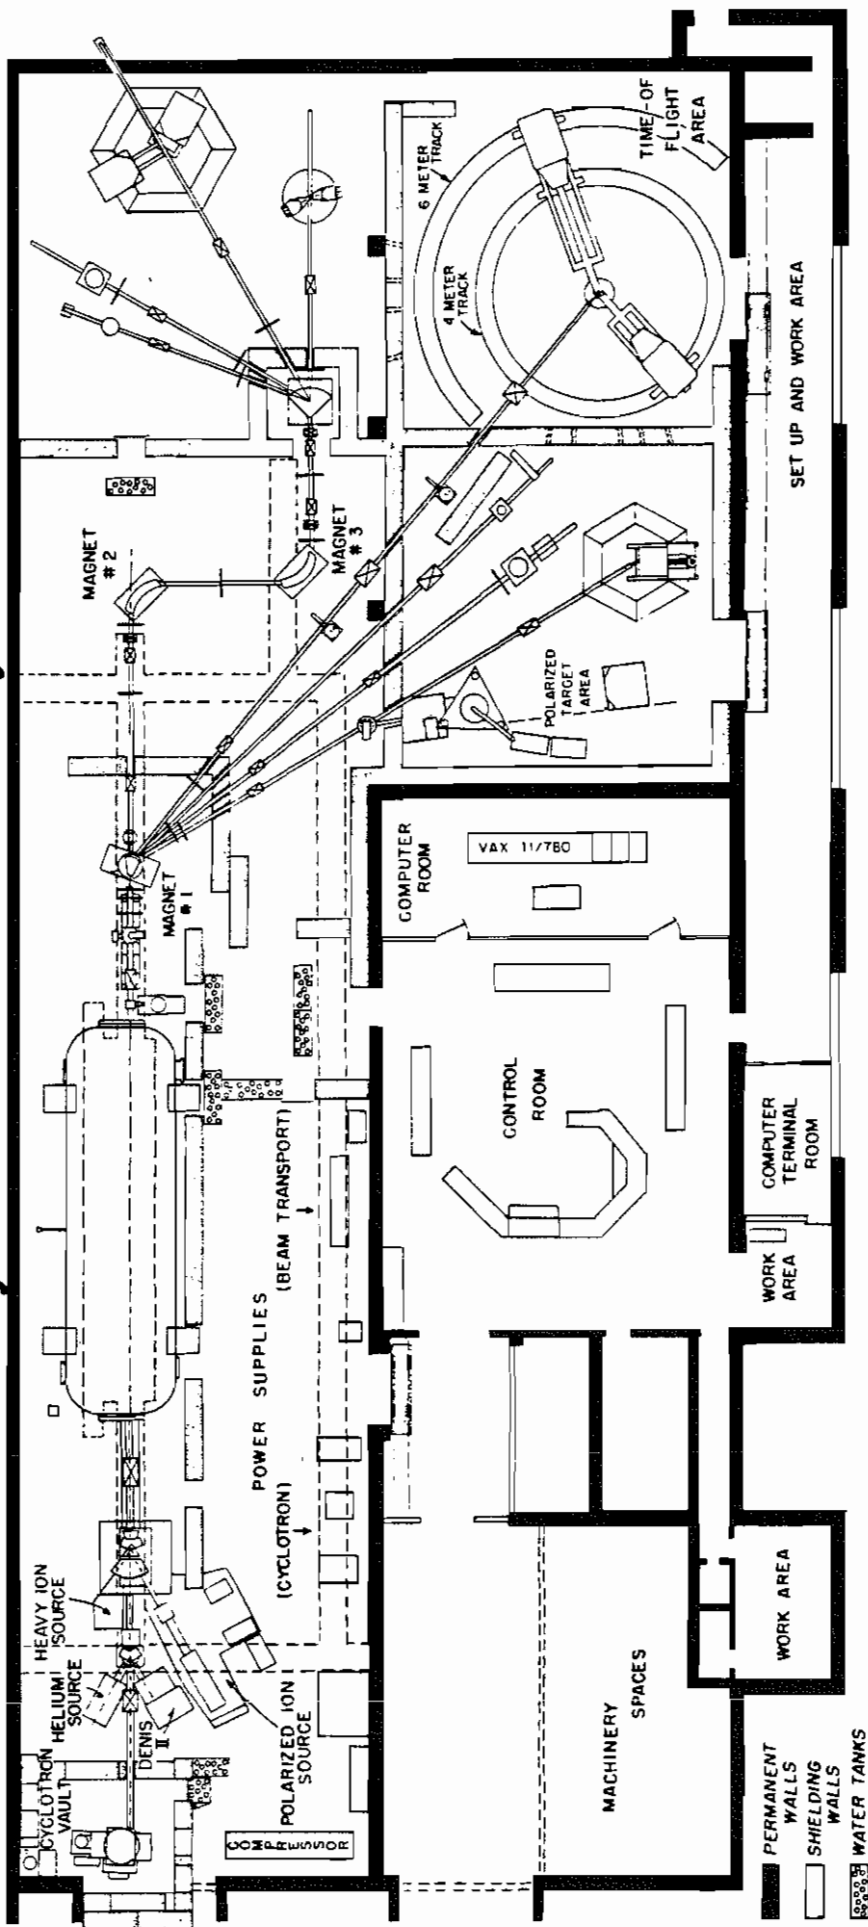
Overall floorplan of the TUNL laboratory (1988).
